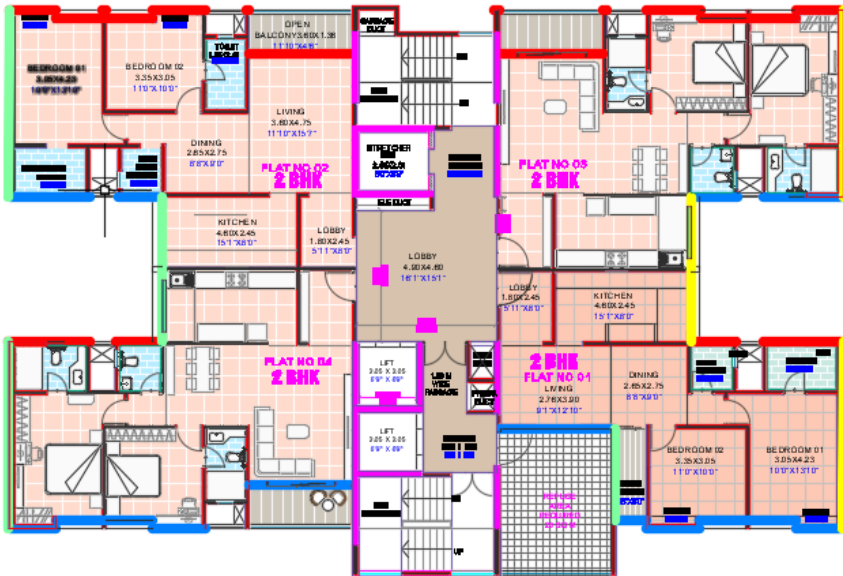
Typical Floor Plan (Kumar Parv, Pune, Maharashtra)
